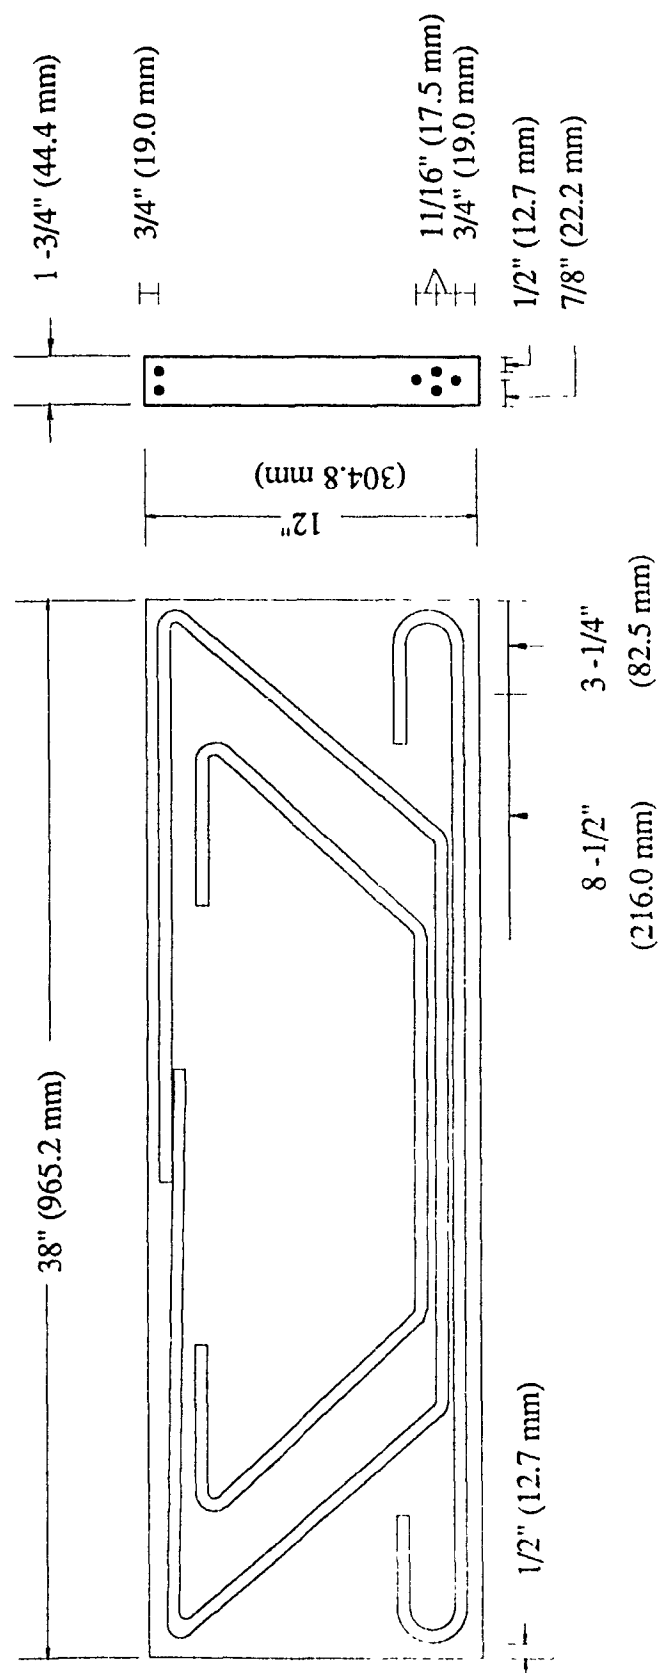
Reinforcement details for sample series A378 and B378
